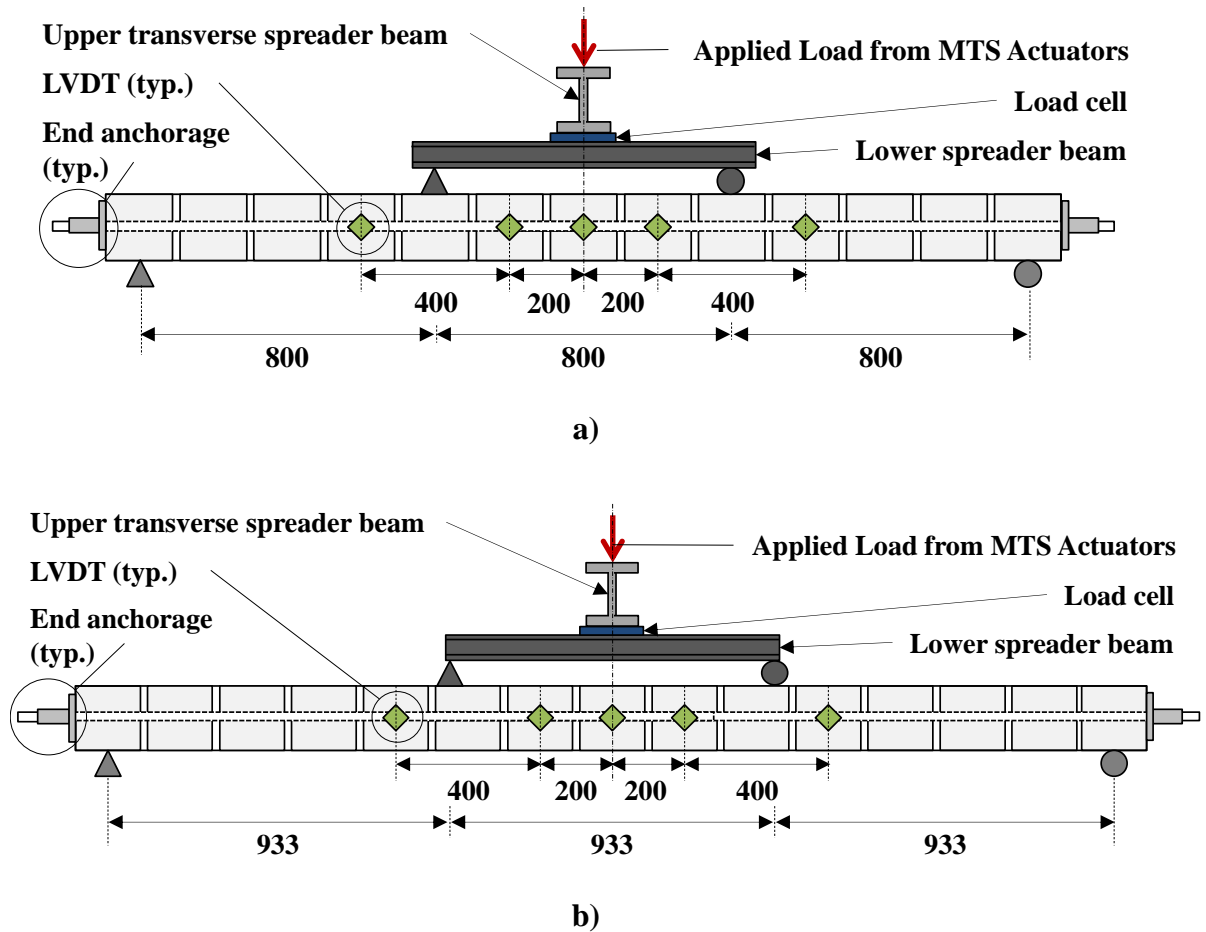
LVDT locations for wall splice specimen testing: a) 13 course high walls, and b) 15 course high walls
